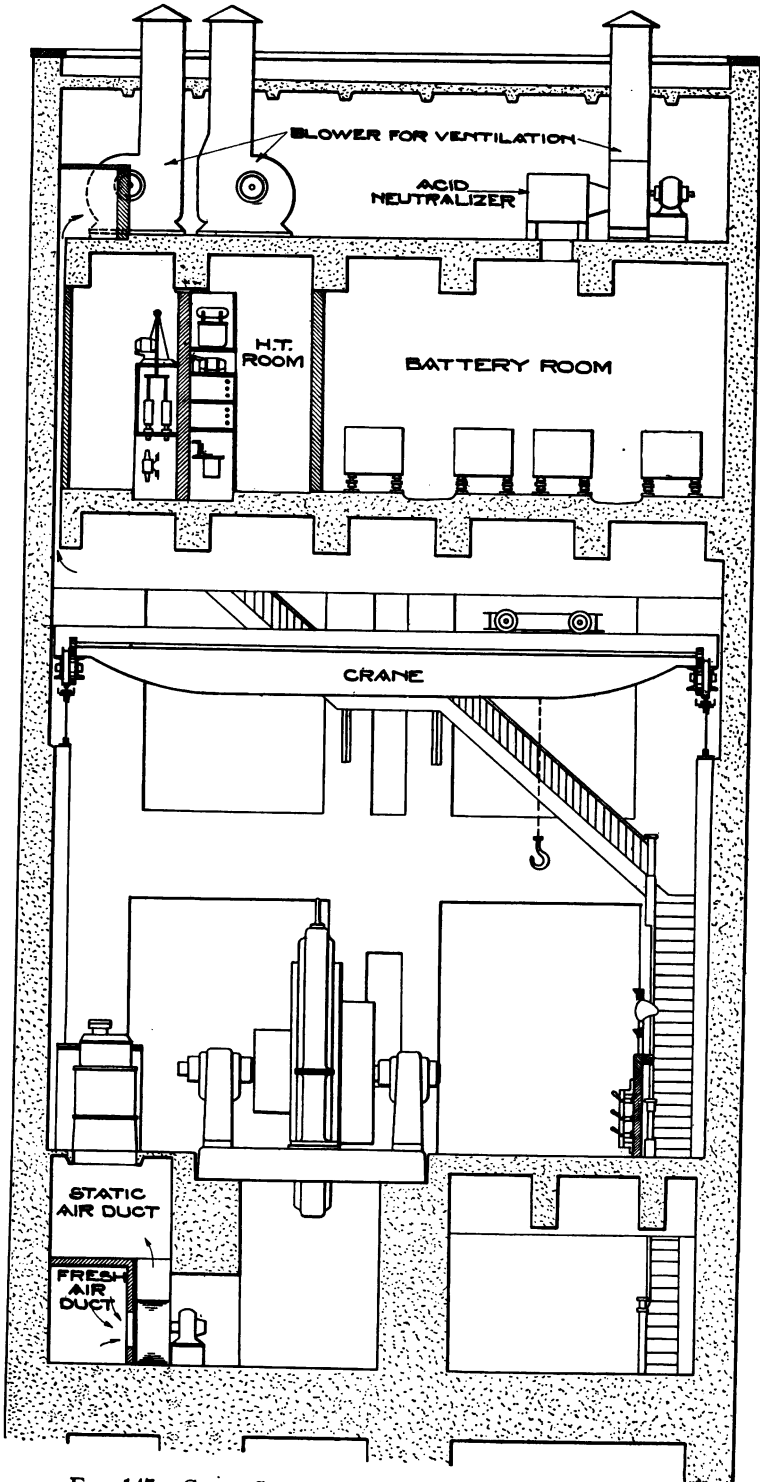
Cross Section, Sixty-fourth Street Substation.
